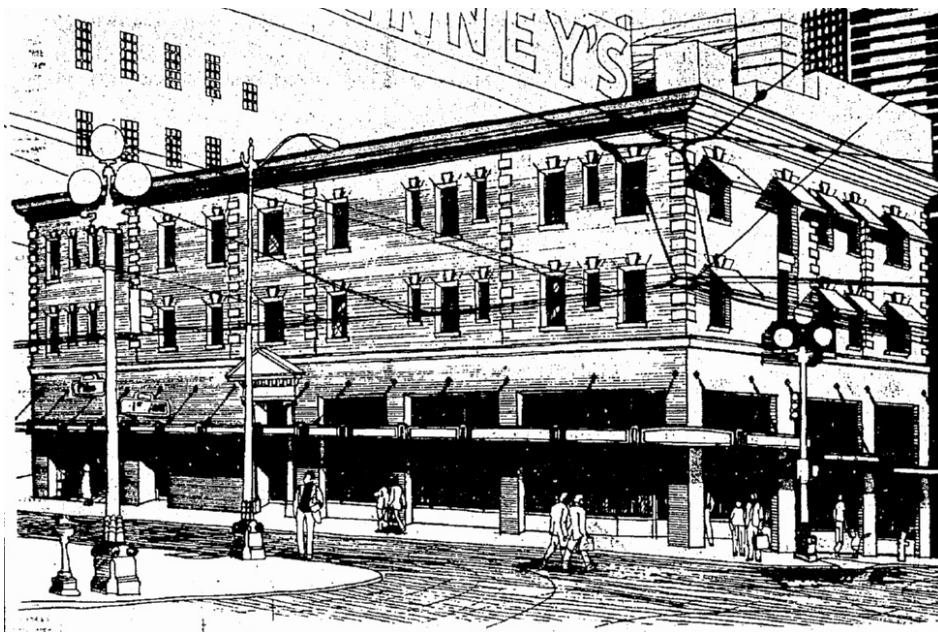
1982 rendering of the Hahn Building showing proposed improvements by Bassetti Norton Metler Architects.
